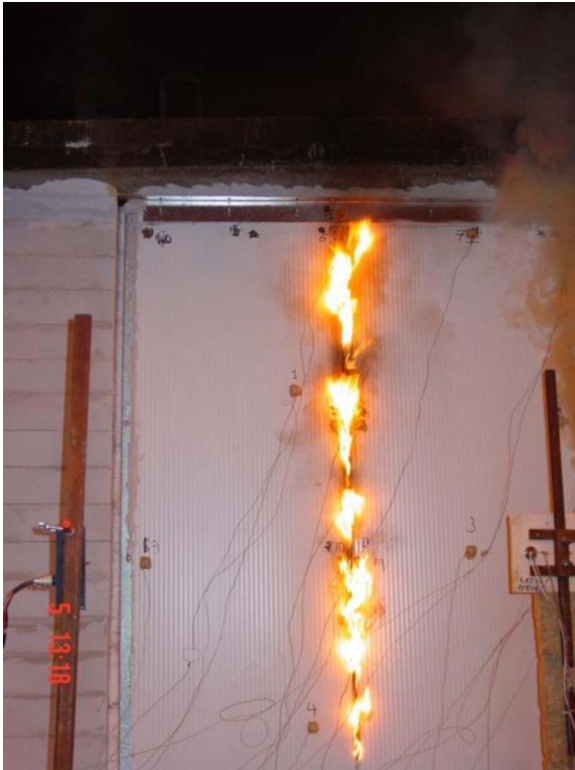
Flames penetrating through sandwich panels at the joint [17].
